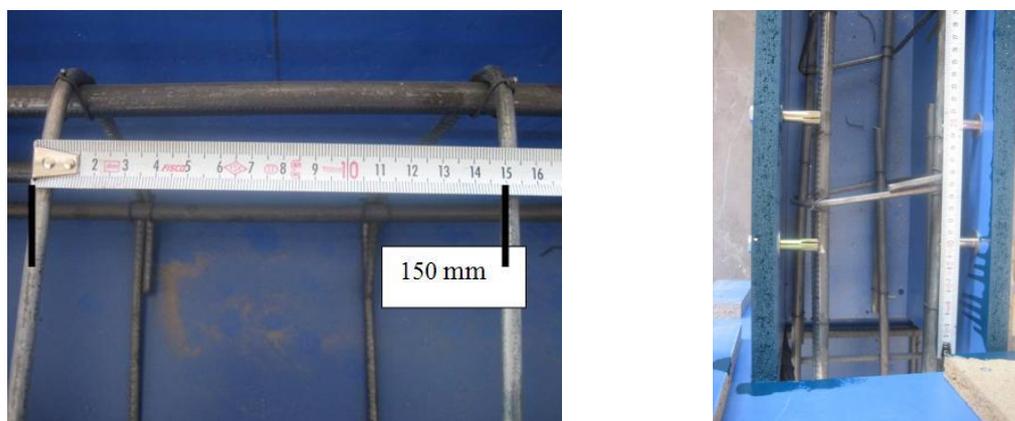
Stirrups spacing and column end lap splice (Korkmaz et al. 2010)
